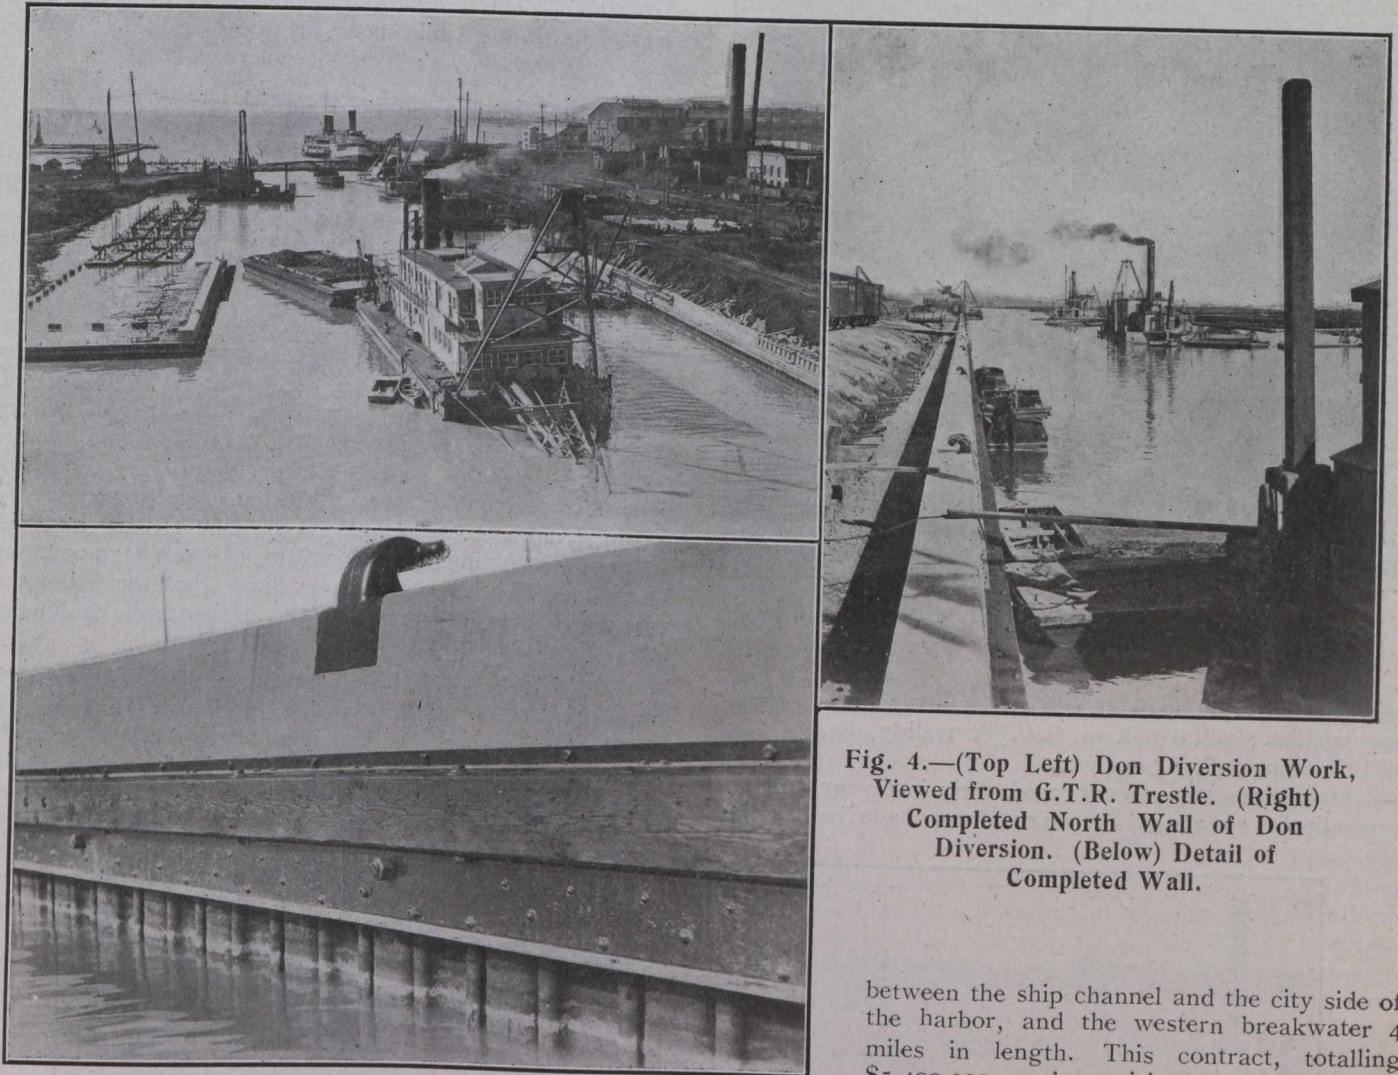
(Top Left) Don Diversion Work, Viewed from G.T.R. Trestle. (Right) Completed North Wall of Don Diversion. (Below) Detail of Completed Wall.
